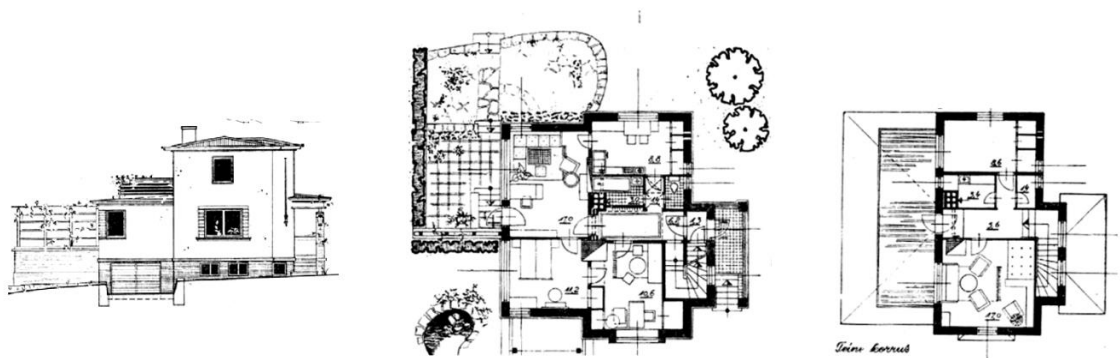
An example of a partly two-floored dwelling from 1959 by L. Volkov (left to right: elevation; ground floor; upper floor) (Veski, Aarmann & Niine, 1959)
